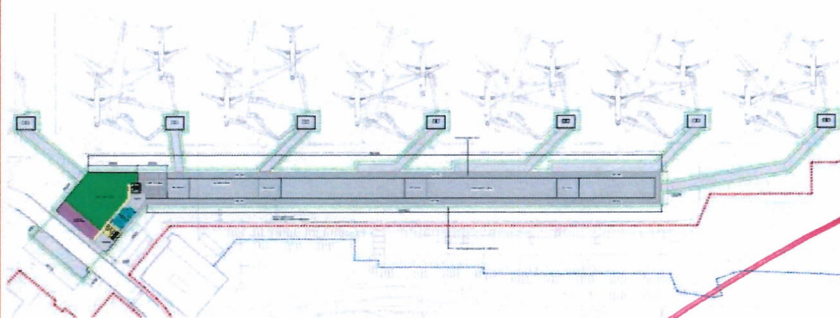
Pier 1 East 2nd Floor Plan (Indicative)
